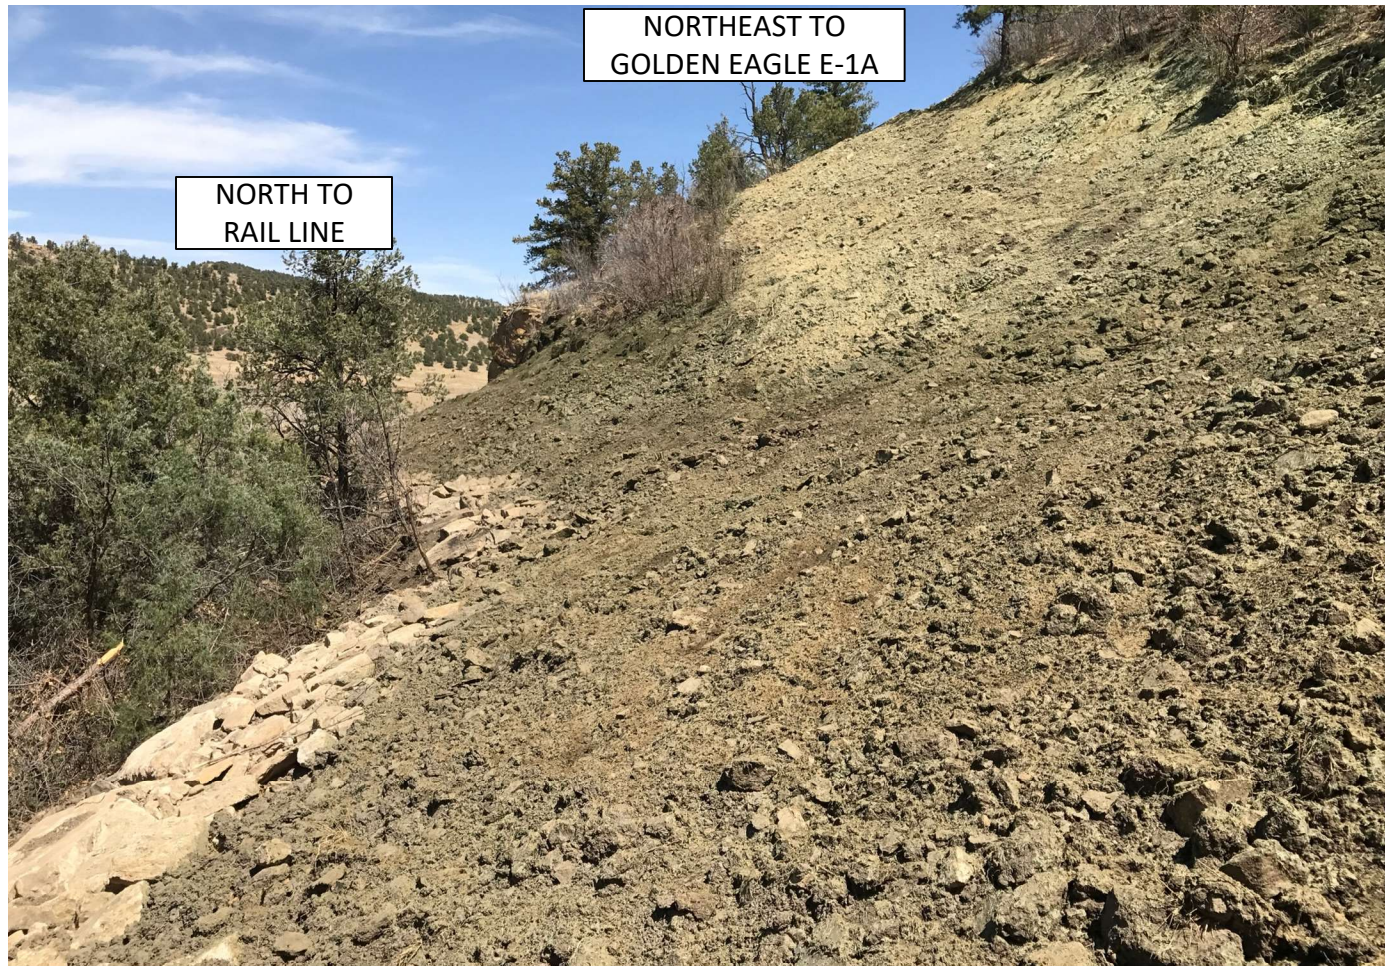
FACING NORTH TOWARD INTERSECTION OF GOLDEN EAGLE MINE E-1, E-2 AND E-1A ACCESS ROAD RECLAMATION. THE ACCESS ROAD WAS RECONTOURED TO MATCH THE SURROUNDING TERRAIN. GRADING TECHNIQUES WERE INSTALLED ON THE CONTOUR. ARMOR WAS INSTALLED AT THE TOE OF THE FILL SLOPE FOR PERMANENT STABILIZATION. THE EARTH DISTURBANCE WAS HYDRO-SEEDING WITH AN APPROVED COLORADO PARKS AND WILDLIFE (CPW) SEED MIX TO PROMOTE THE ESTABLISHMENT OF VEGETATION.
